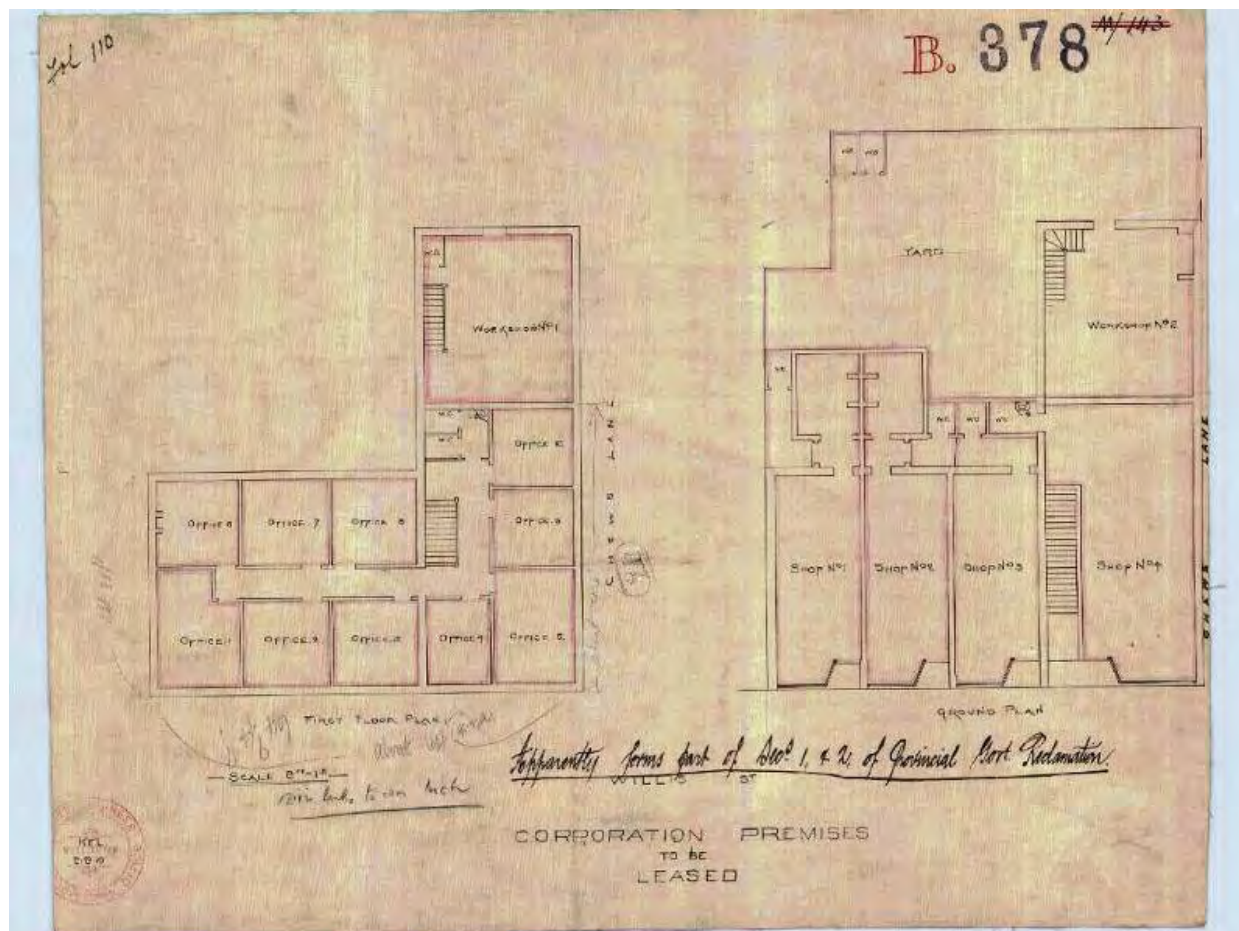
Details of buildings on Willis Street on northern side of Chews Lane, 1910
